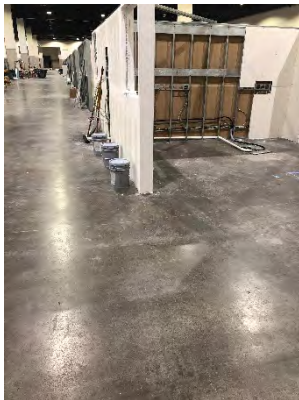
Partially Completed Wall with Exposed Framing, Wiring, and Plumbing
